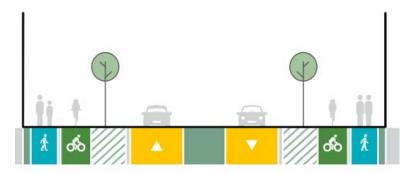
CFAF Outcome S3: Luckens Road to Brigham Creek Road Indicative 24m cross section
